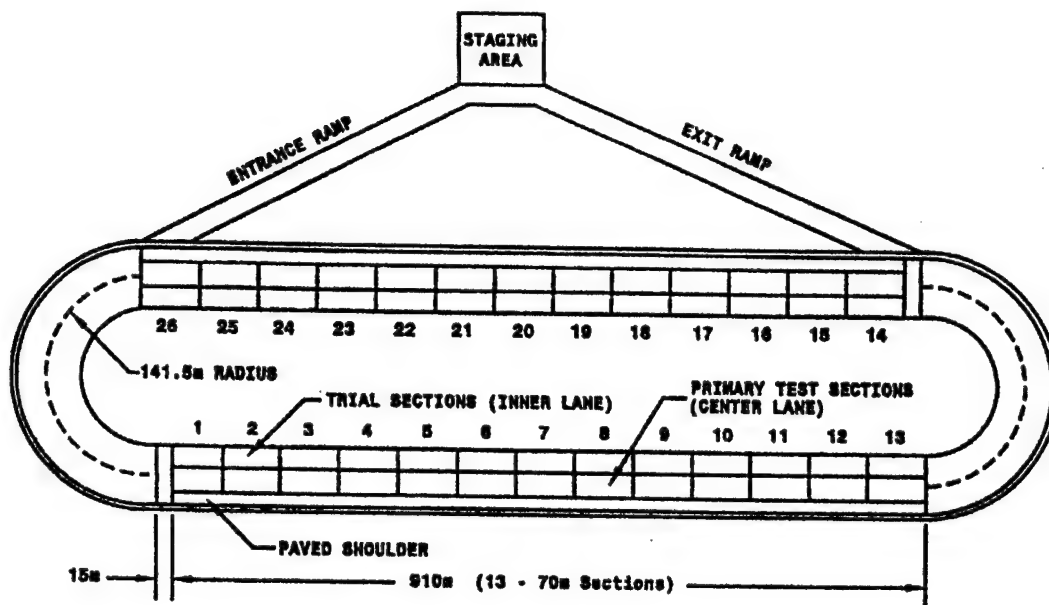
WesTrack Test Site Layout (not to scale)(3)
